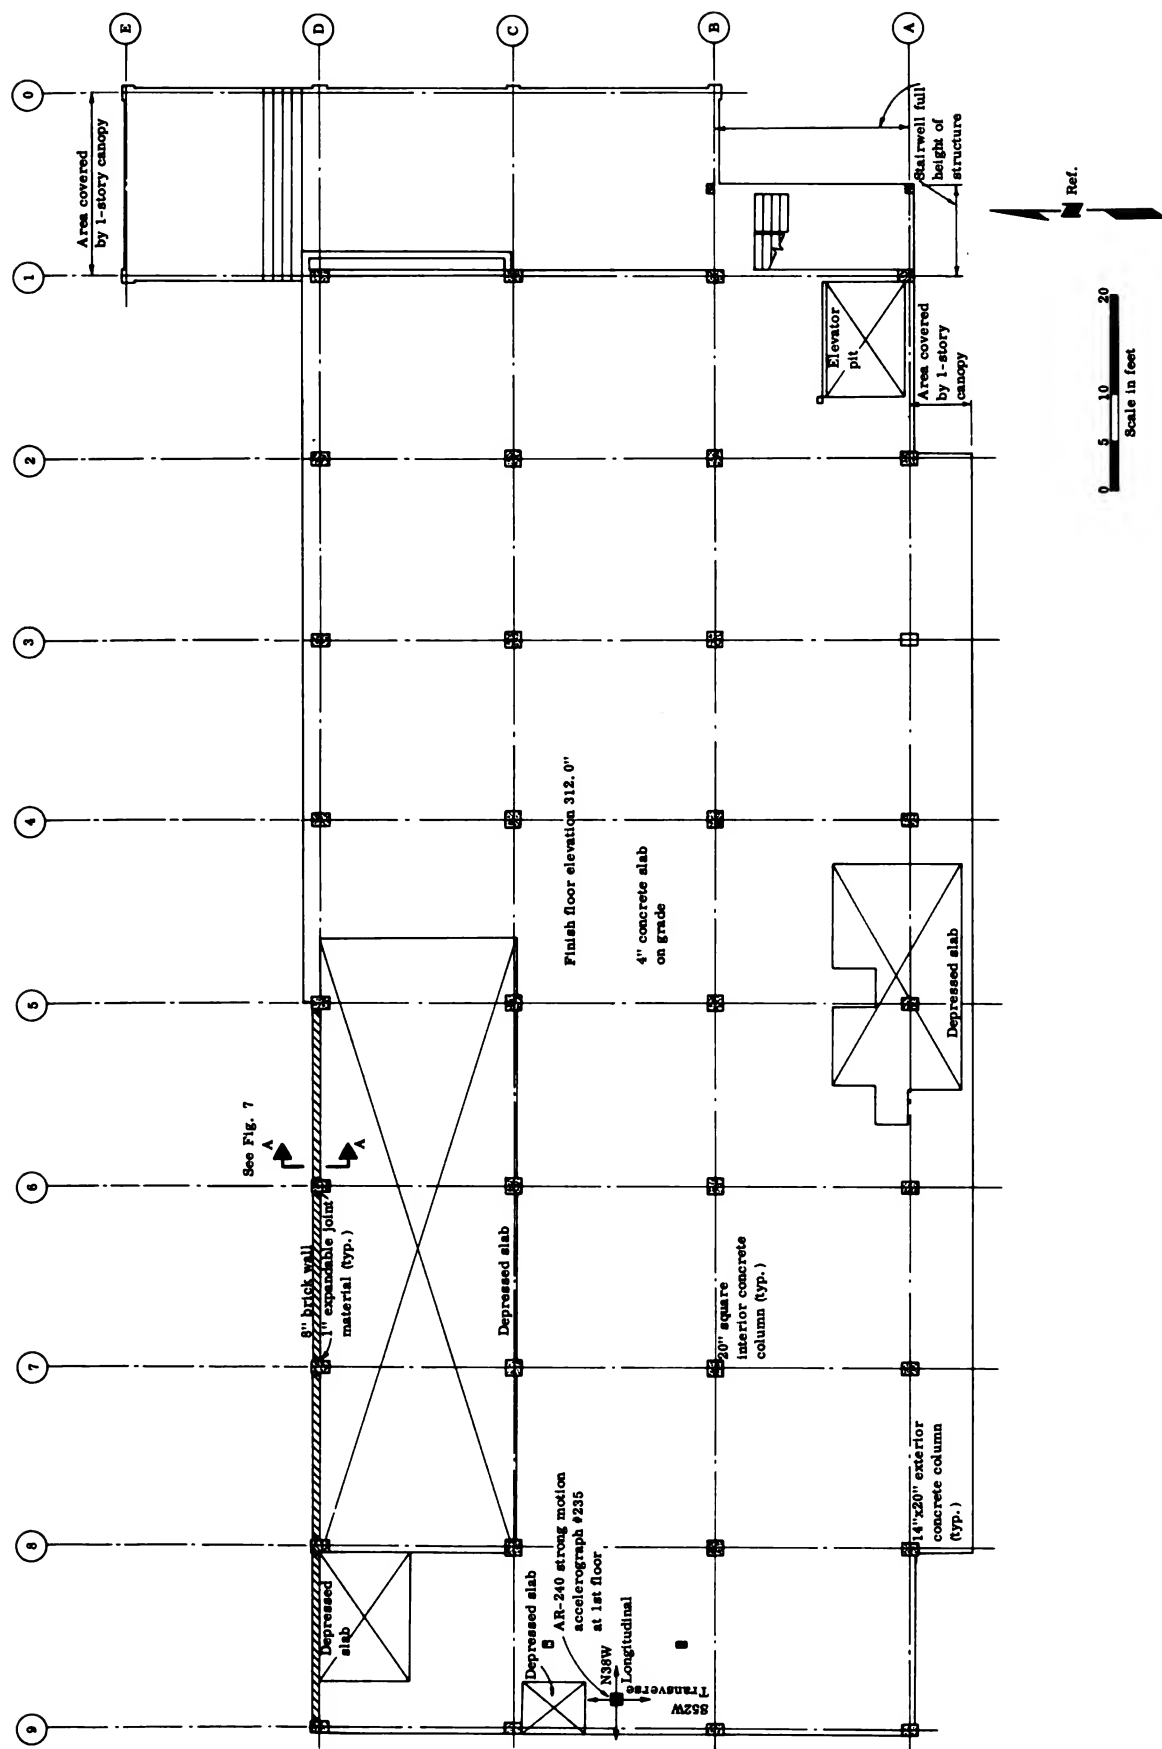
Holiday Inn, Marengo Street. First-floor plan.
